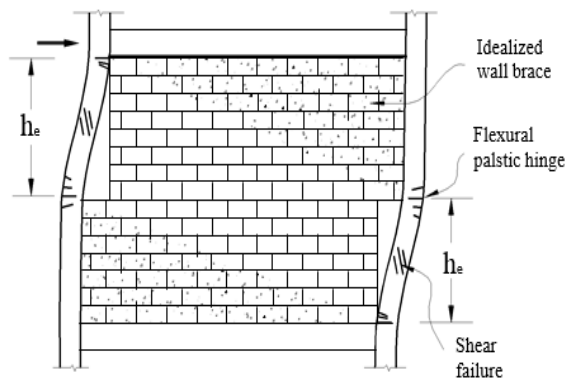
Knee-braced frame model for sliding shear failure of masonry infill(Paulay and Priestly,1992)
